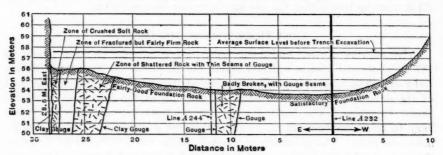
RODRIGUEZ DAM: LONGITUDINAL SECTION OF CUT-OFF TRENCH IN STREAM BED.
